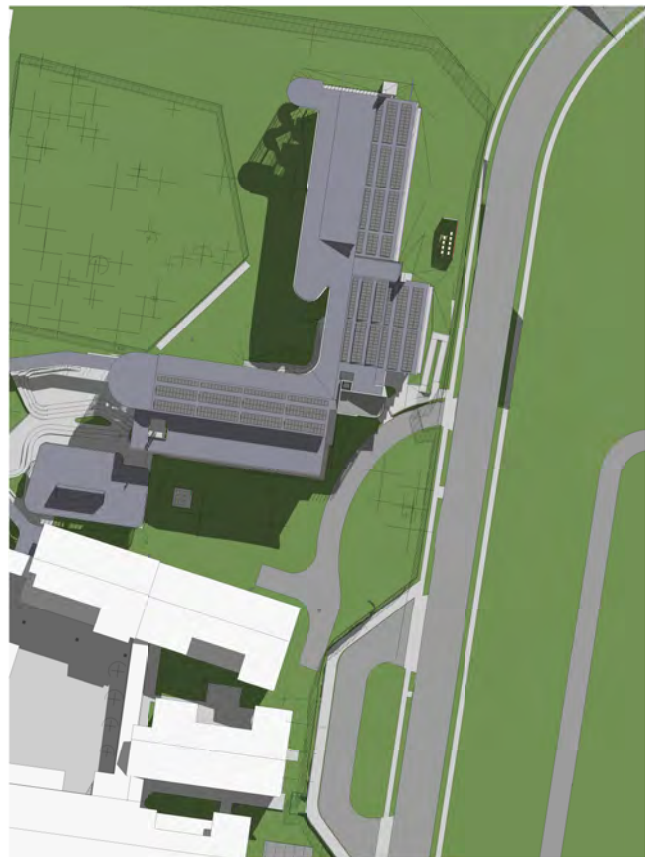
Site plan extract depicting the shadows of the proposed development at 10 am
